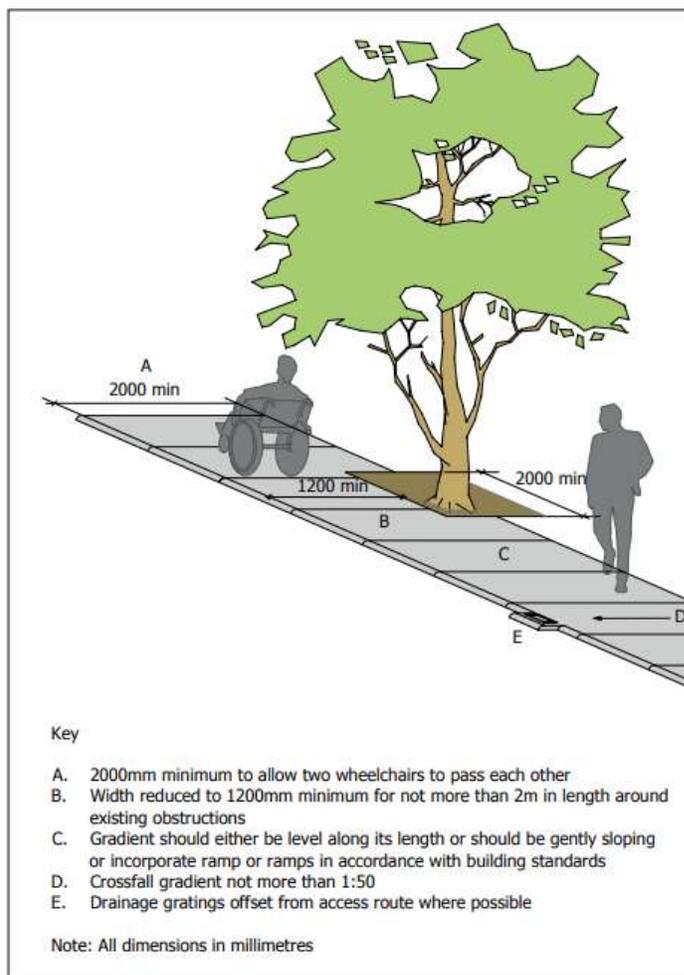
Urban Environment Pavement Layout (Note: Extracted from NDA *Building for Everyone: A Universal Design Approach*)
